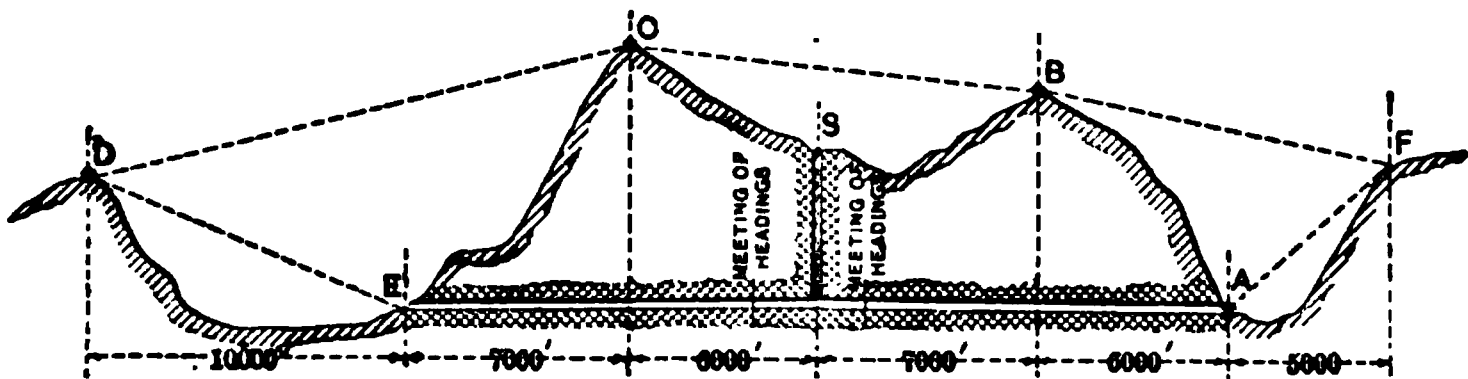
SKETCH OF SECTION OF THE HOOSAC TUNNEL.
